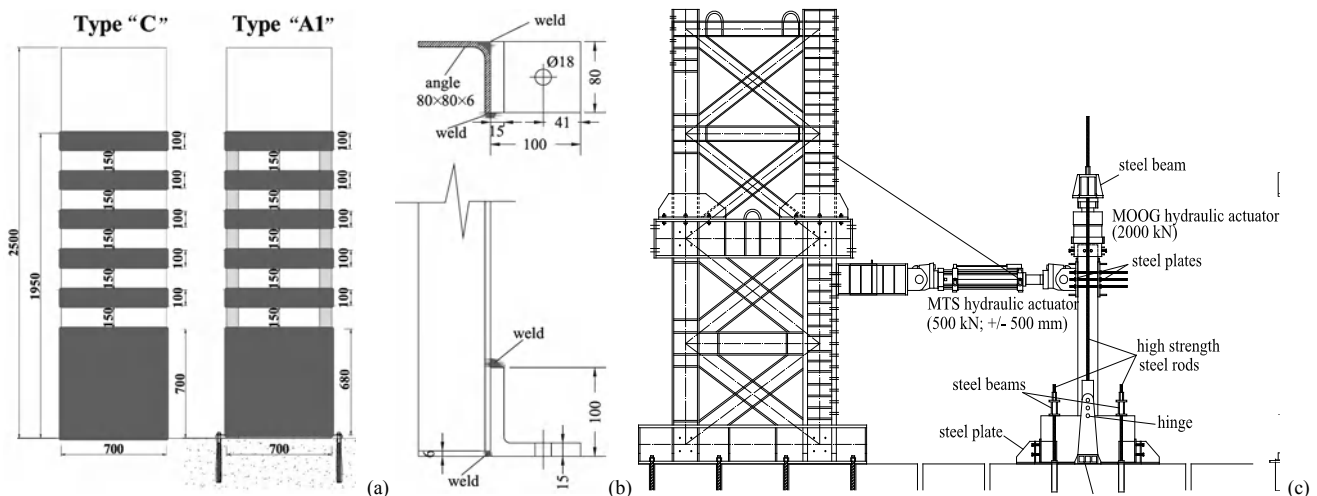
FRP strengthening systems (a); details of the anchorage in the Type A1 system (b); test setup (c)
